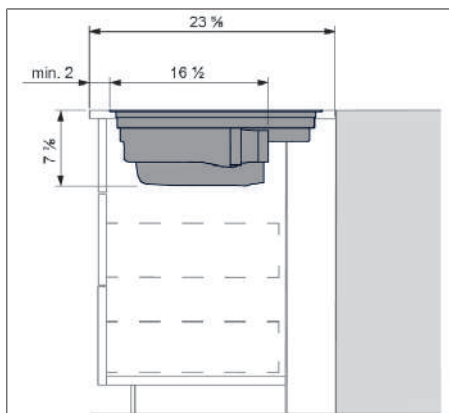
Installation dimensions for exhaust air, worktop depth $23 \frac{5}{8}$ " [60 cm]
